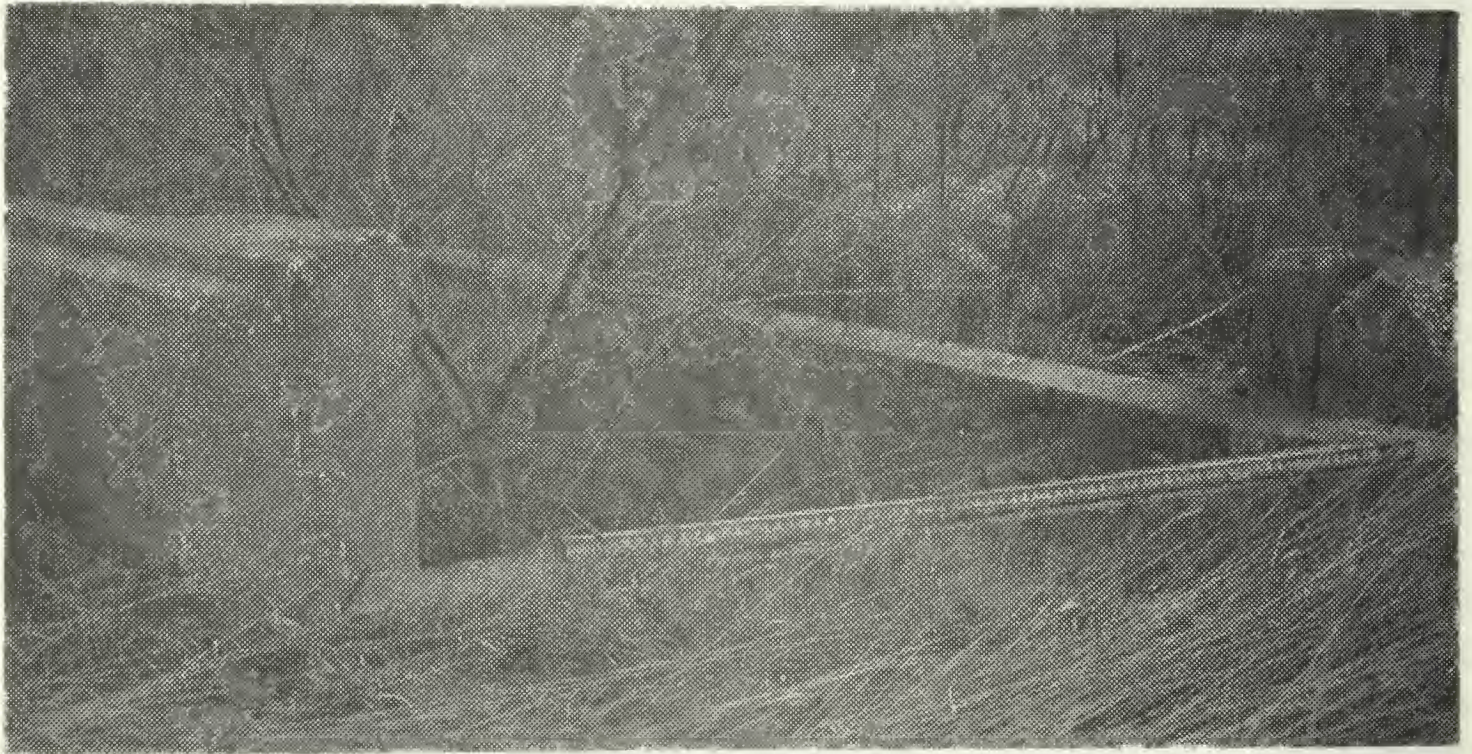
B. Wabash Freighthouse Complex, Concrete Foundation, 1980.
